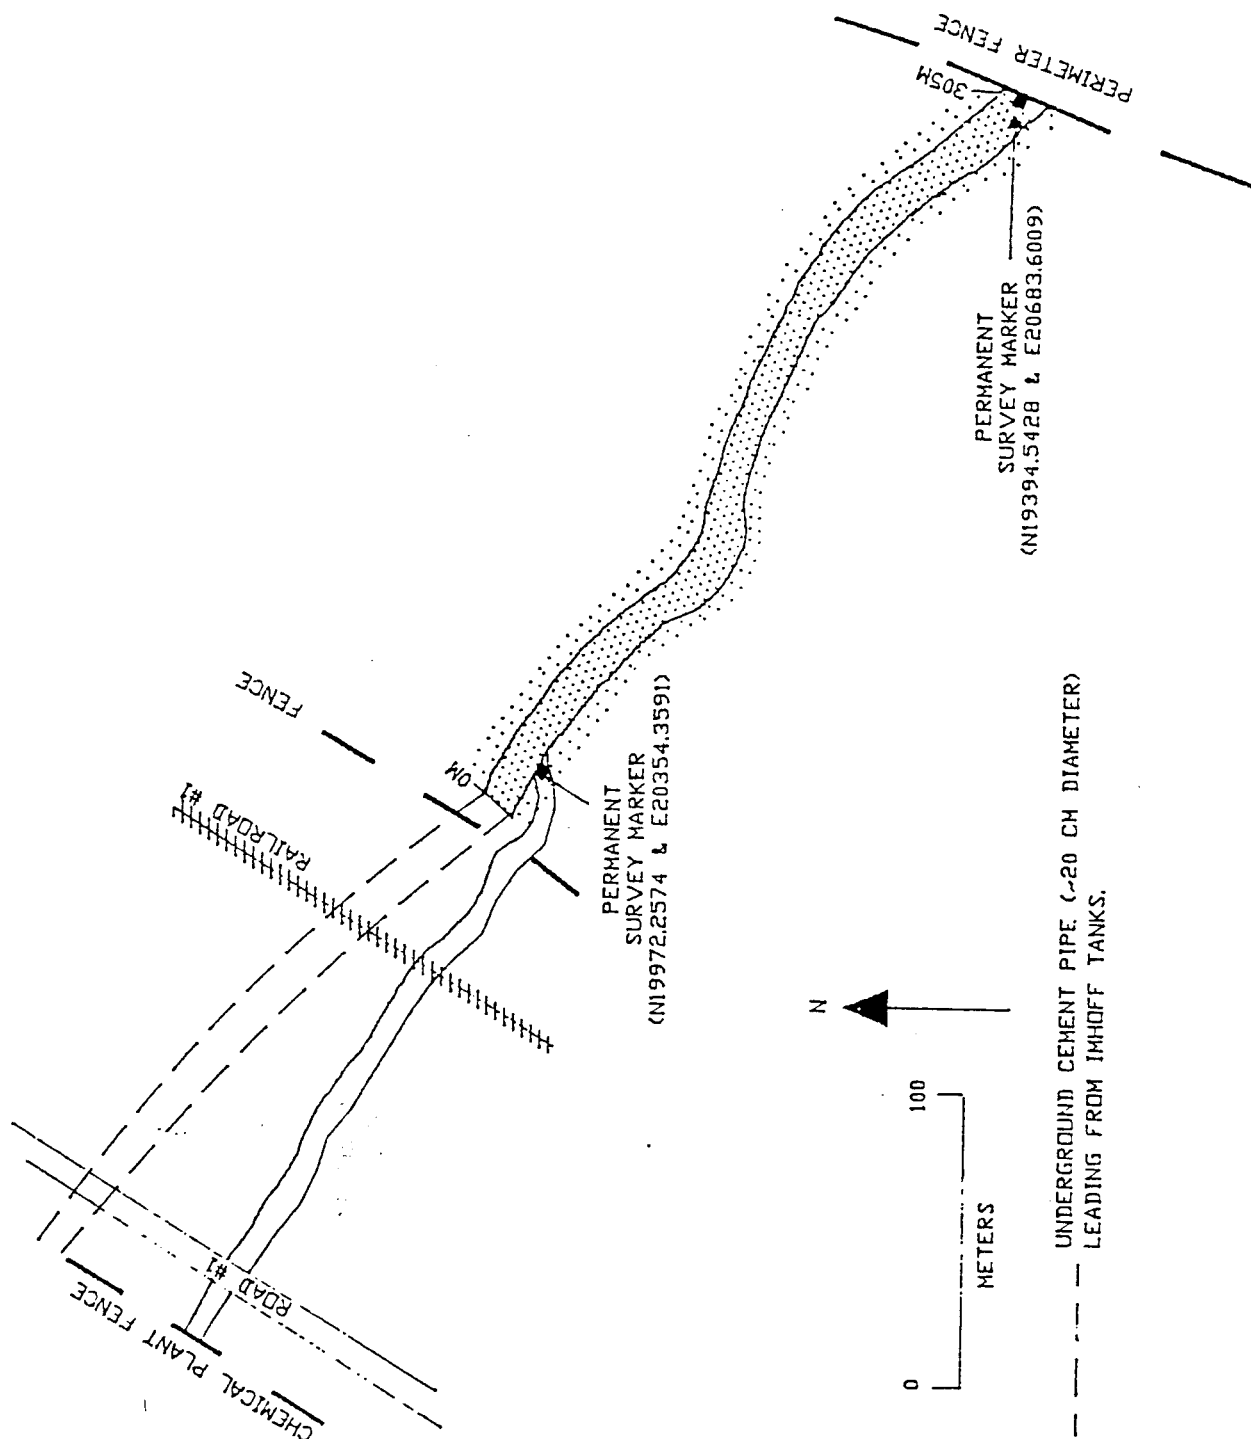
Location #4---Southeast Drainage Easement Area
